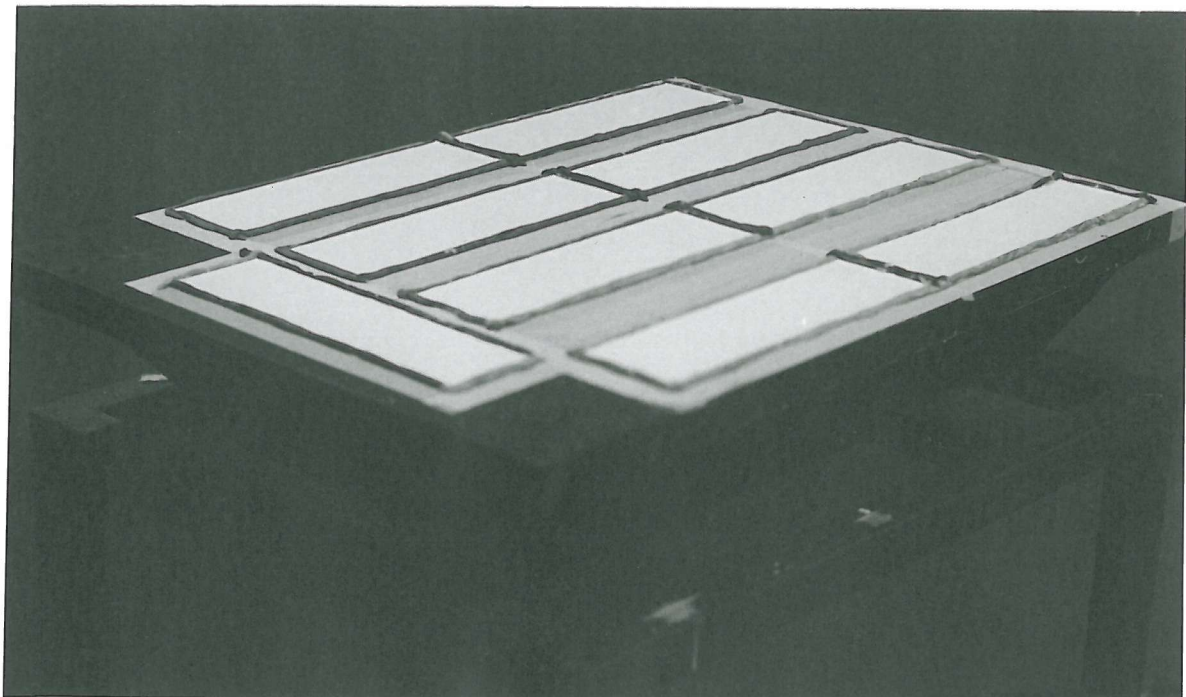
The Table Kept Ready for Casting the Sheets
